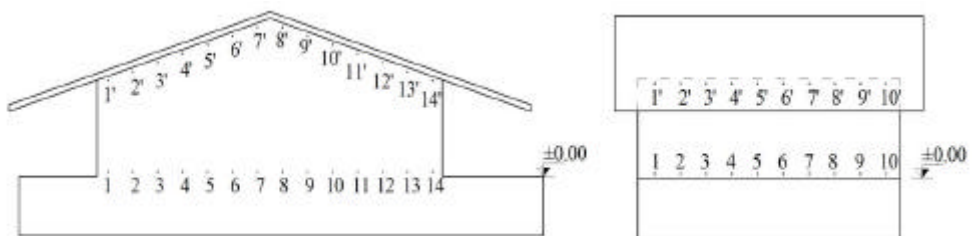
Pressure points on south/north façades (left) and east/west façades (right)
